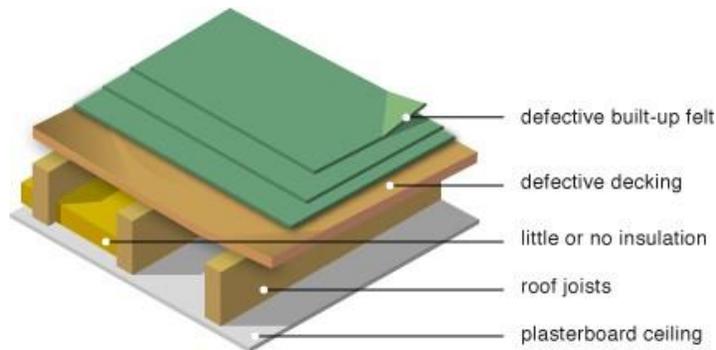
Cold roof insulation (Source: www.greenspec.co.uk building design).
